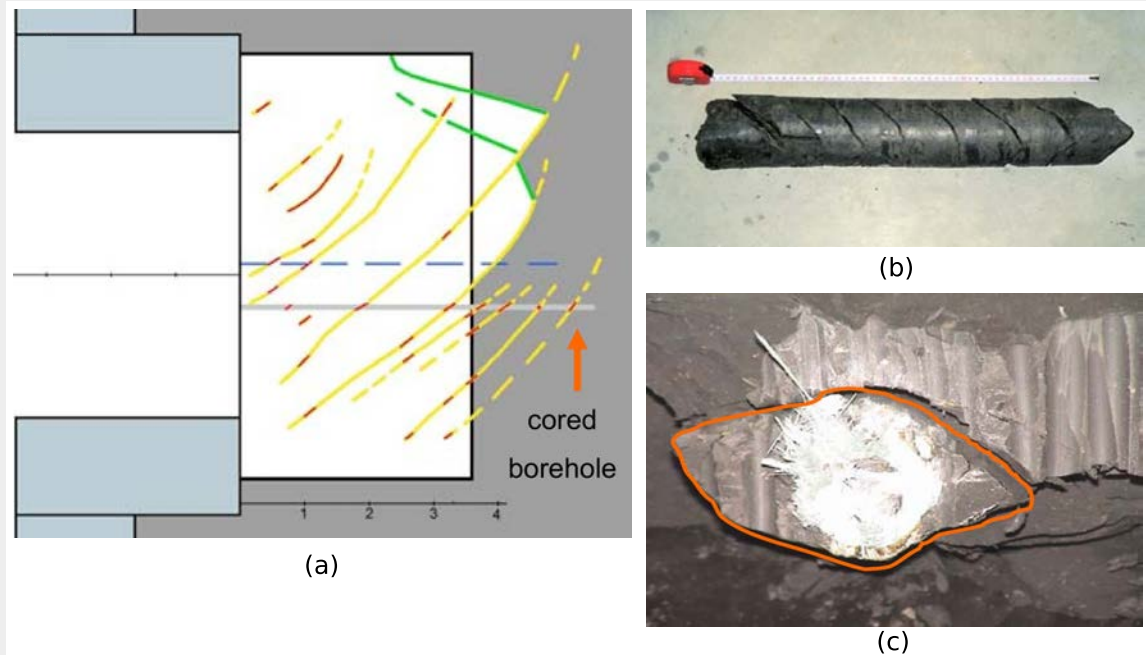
(a) Vertical cross section through the Mounting Chamber (in red - measured shear planes, both before the excavation and during its excavation, in yellow - all the observations of shear planes, in green - tension fissures, dotted lines - extrapolations), (b) Intense fracturation of core sample due to the drilling process. (c) An anchor surrounded by resin that has partly penetrated into drilling-related fractures of the Boom Clay. (Bastiaens et al., 2003).
